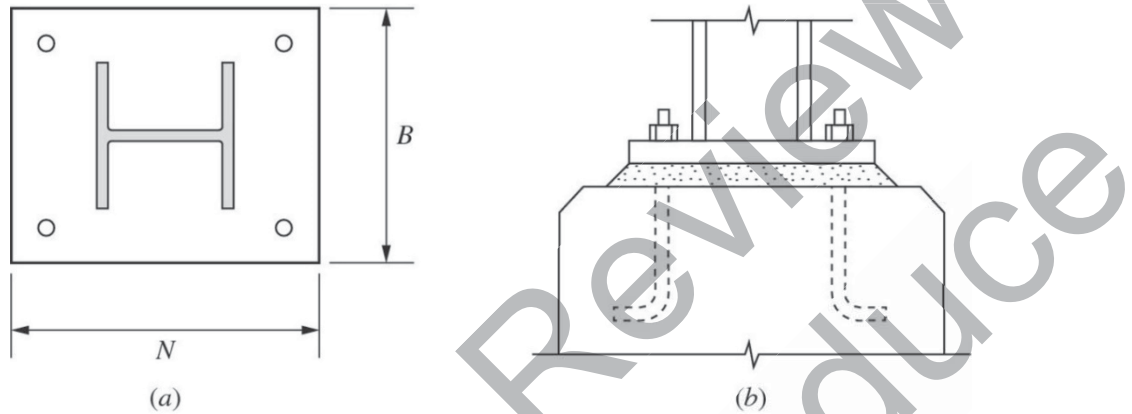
Column and Base Plate Section and Plan Including Anchor Rods
